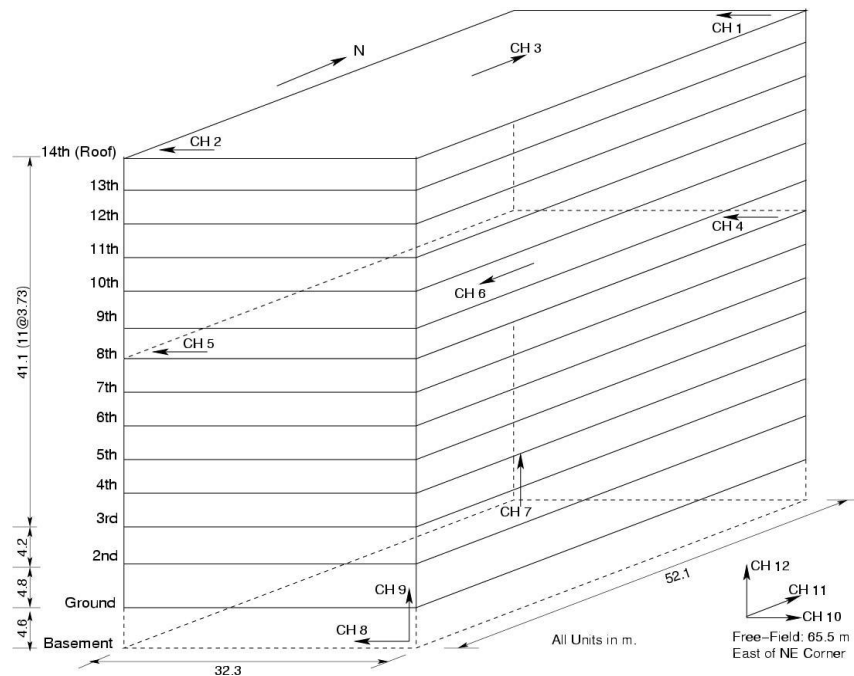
Sketch of Building Instrumentation with the Free-Field Station
